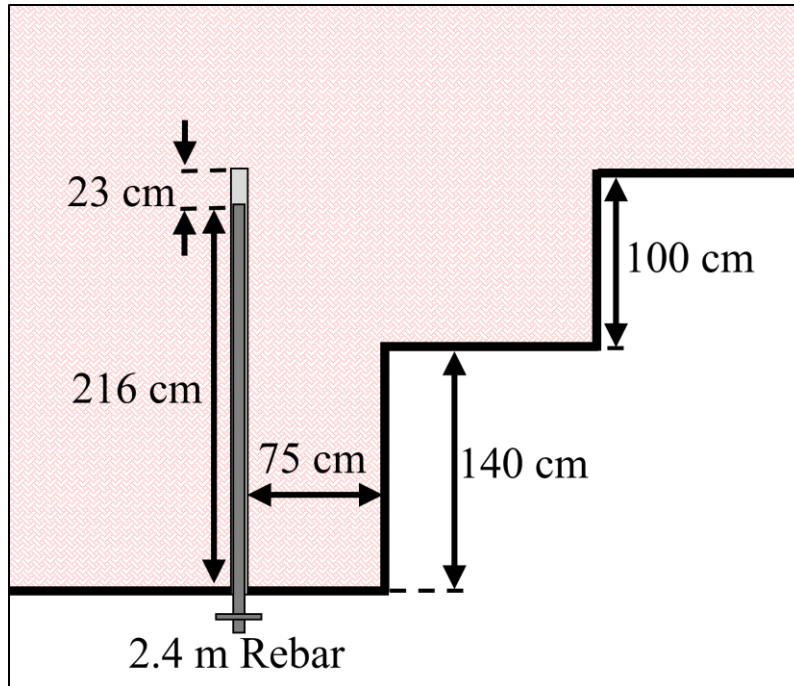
Position of instrumented 25M rebar in ramp brow at Nutrien Allan
